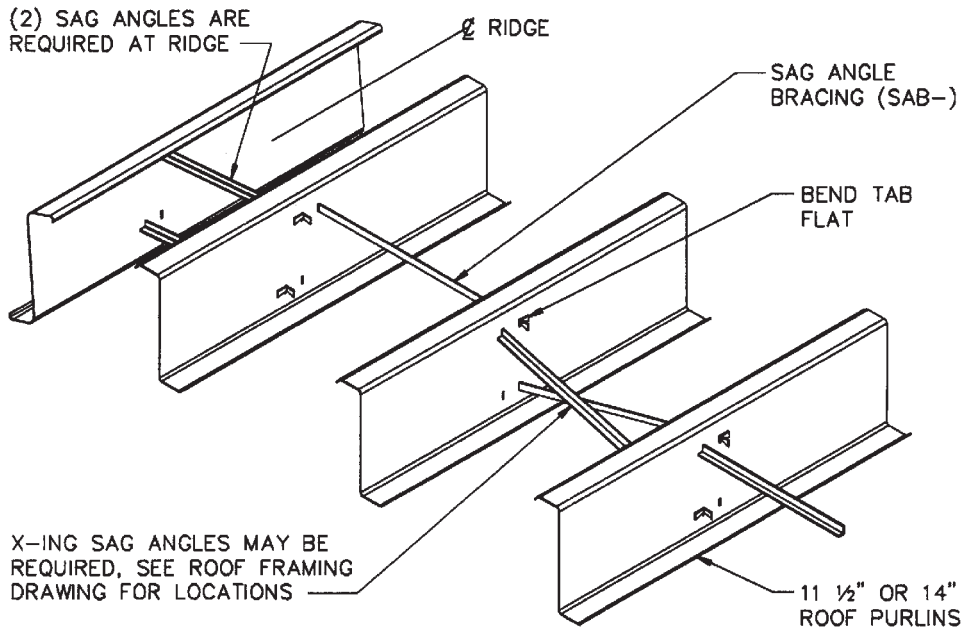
Typical detail of crisscrossed sag angles. (VP Buildings.)
